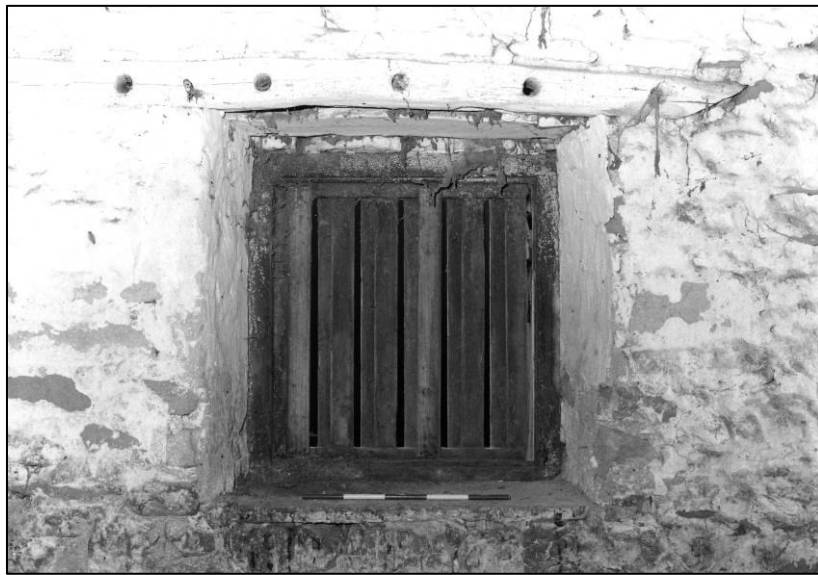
Granary: GF N cell, window ventilator, looking NW (photo 2/1).
